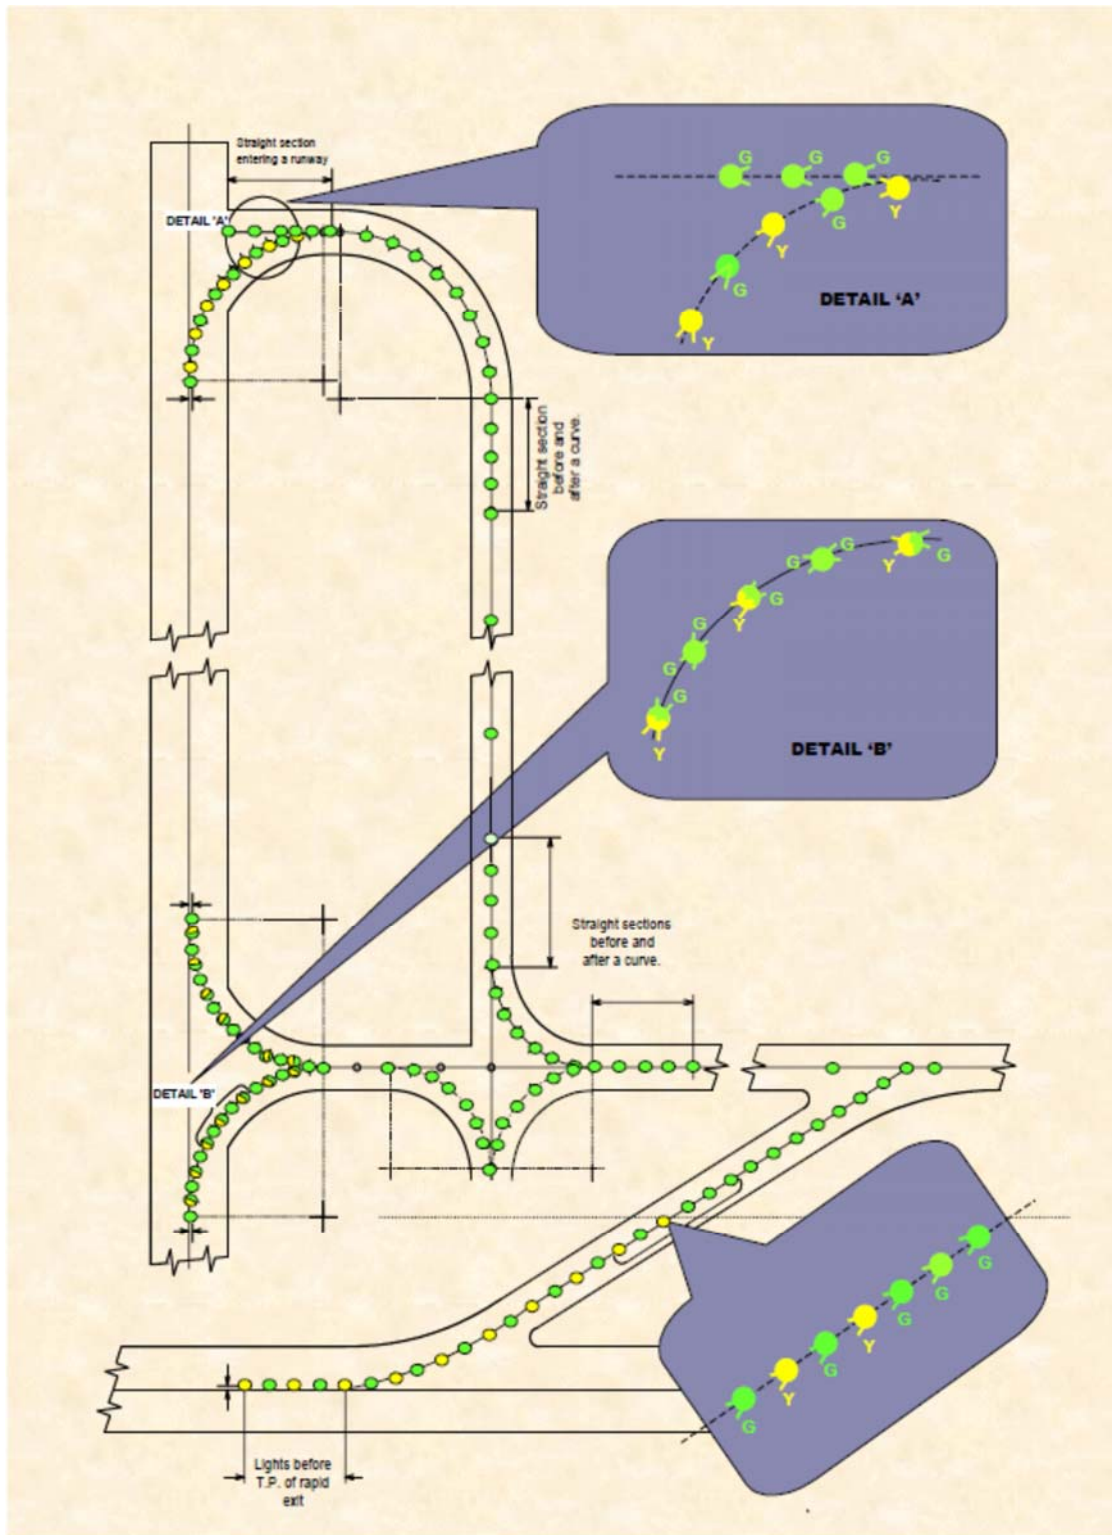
Typical Taxiway Centreline Lights Layout
